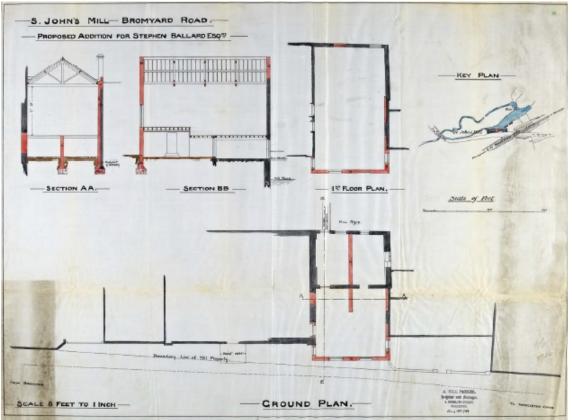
Building C original plans, St Johns Mill- Bromyard Road-Proposed addition, (Building application number 2756)
